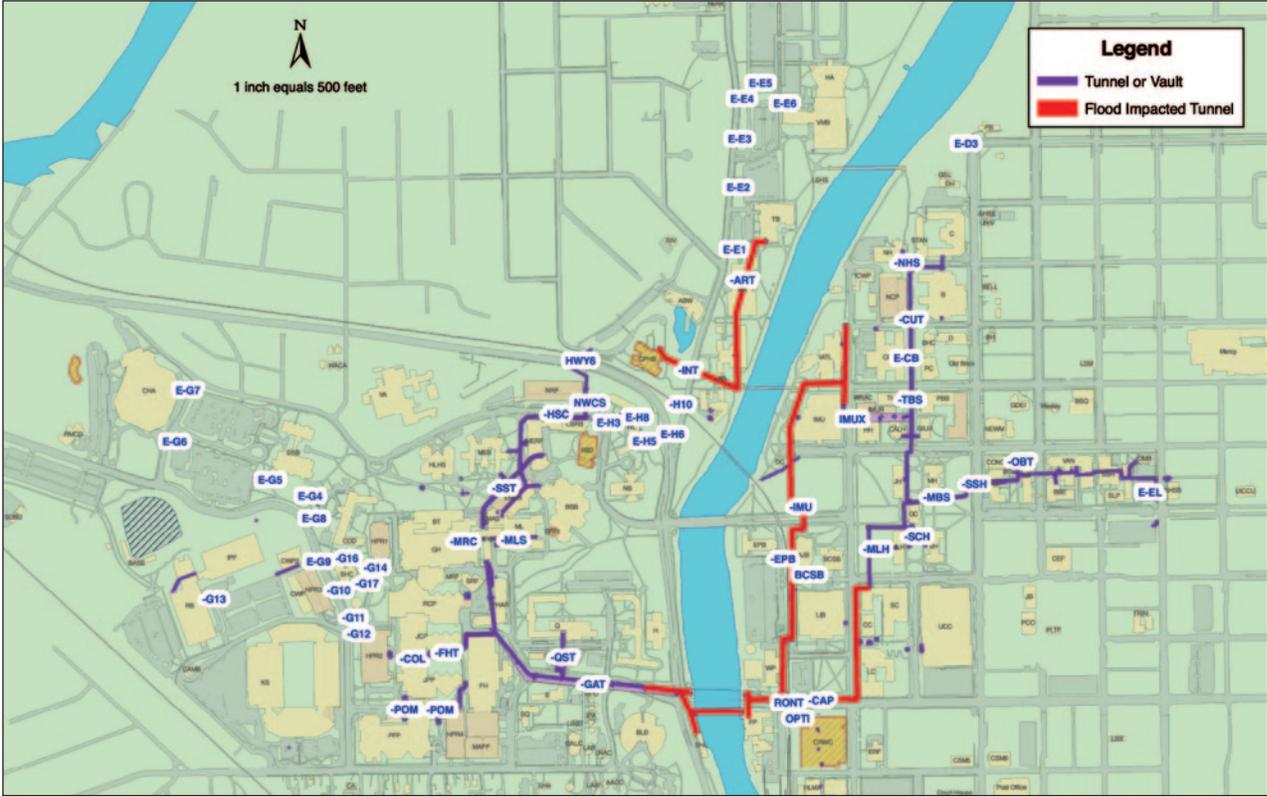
Schematic layout of campus tunnels indicating flooded areas
